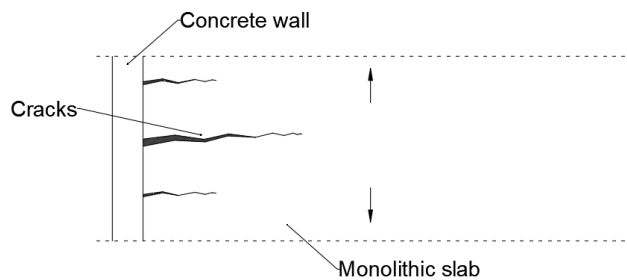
Shrinkage induced cracking at boundary between monolithic floor and wall.
